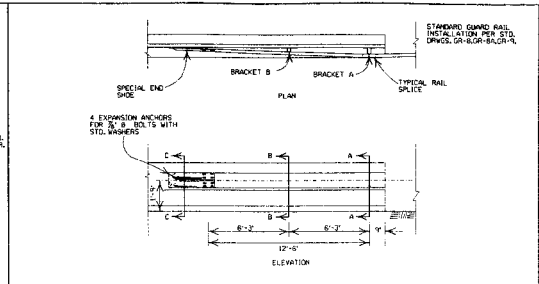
DETAILS OF CONNECTION TO STEP-CURB TYPE PARAPET WALL
